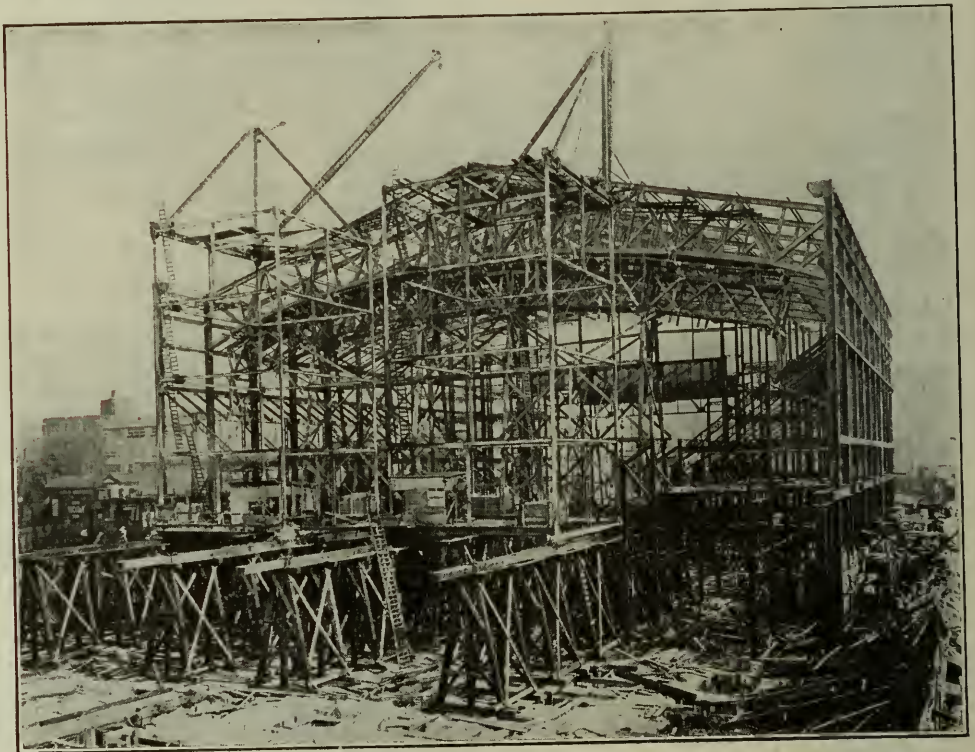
AUDITORIUM ERECTION PLANT: DERRICK AND FALSEWORK TOWERS COUPLED FOR ROLLING TO POSITION FOR NEXT TRUSS
